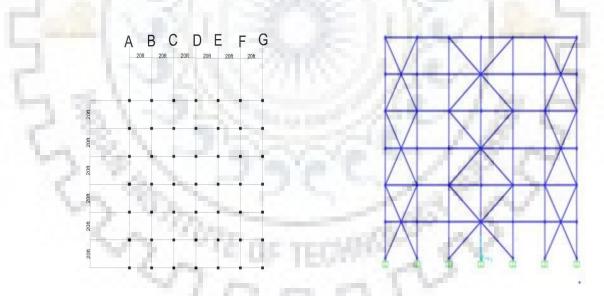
Plan of low-rise stack bracedFigure 3.14 Elevation of low-rise stackframebraced frame
